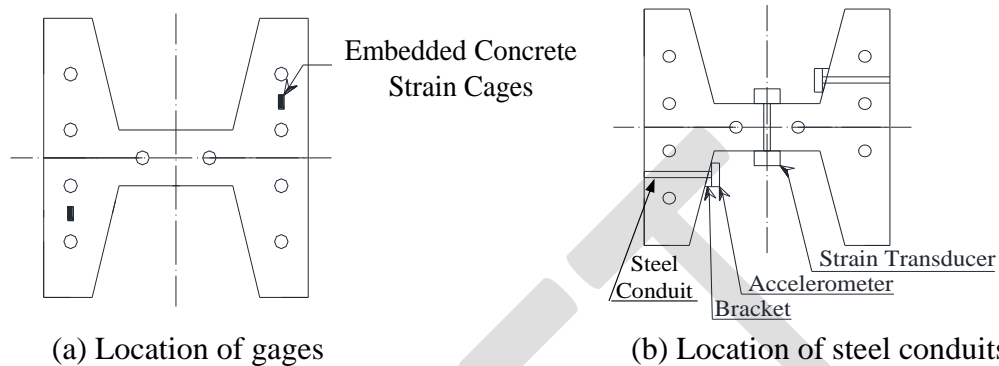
Location of embedded concrete strain gages and steel conduits for PDA testing
